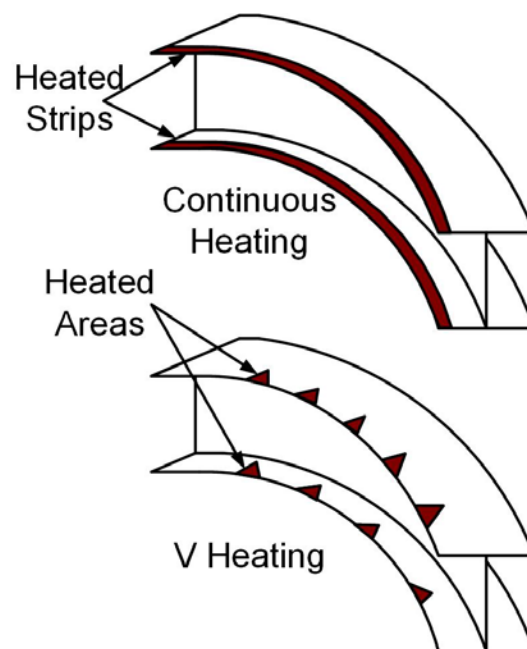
Examples of strip and v-heat curving of girder flanges.
